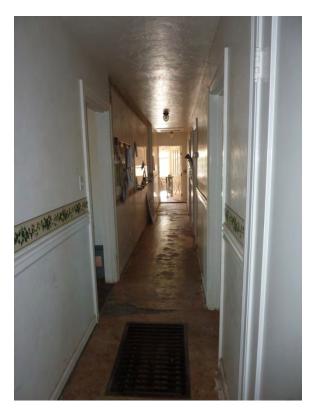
Hallway looking toward the kitchen. The door at the left is to the entrance hall. The door in the right foreground is the linen closet, the next door is the bathroom and the next two doors are bedrooms.
